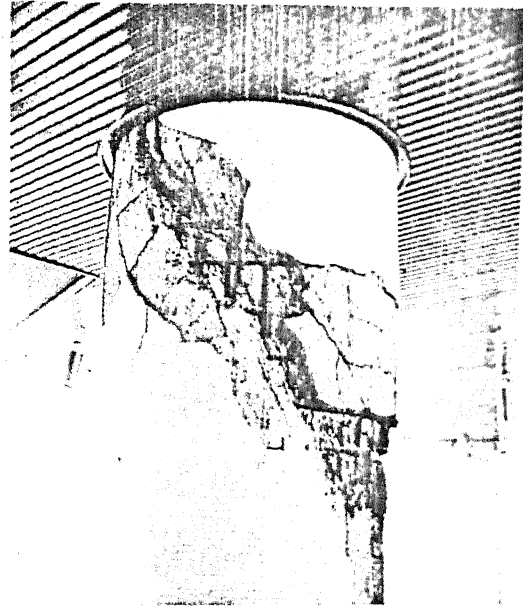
Macuto Sheraton's mezzanina damaged column.
